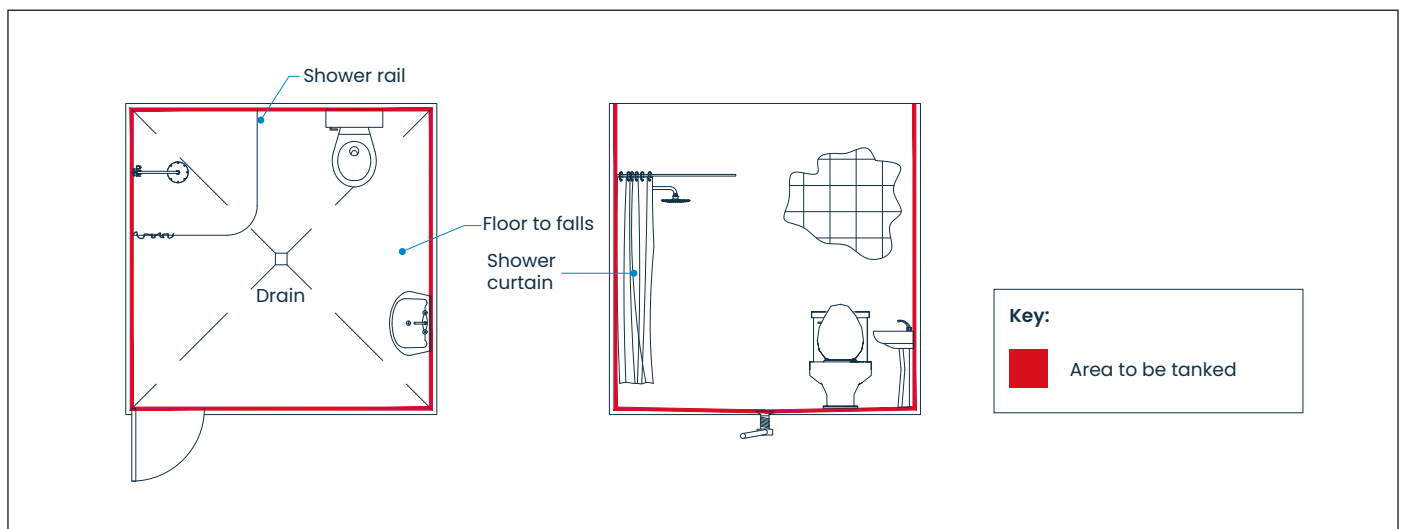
Typical example of wet room configuration without fixed wall or screen
